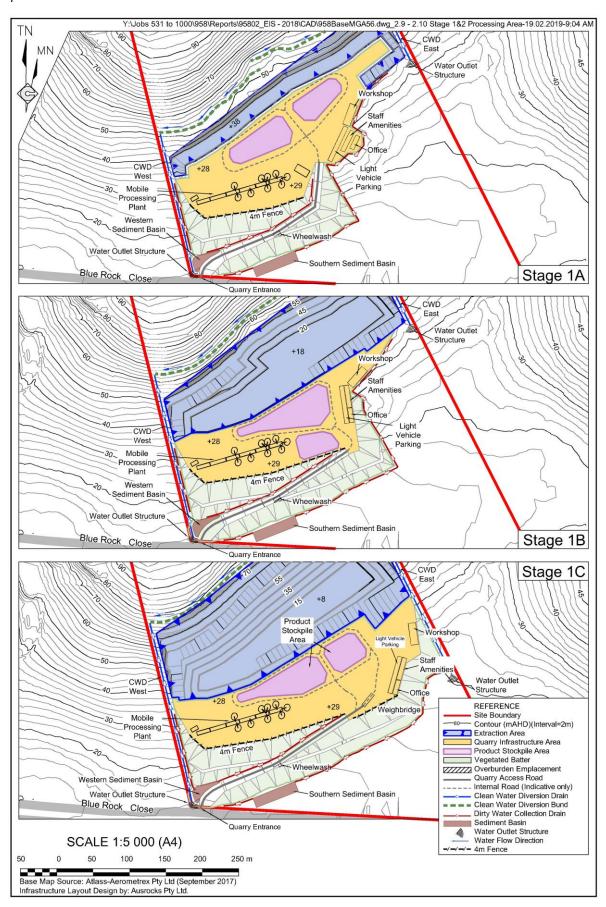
Stage 1 Indicative Infrastructure Pad Layout
